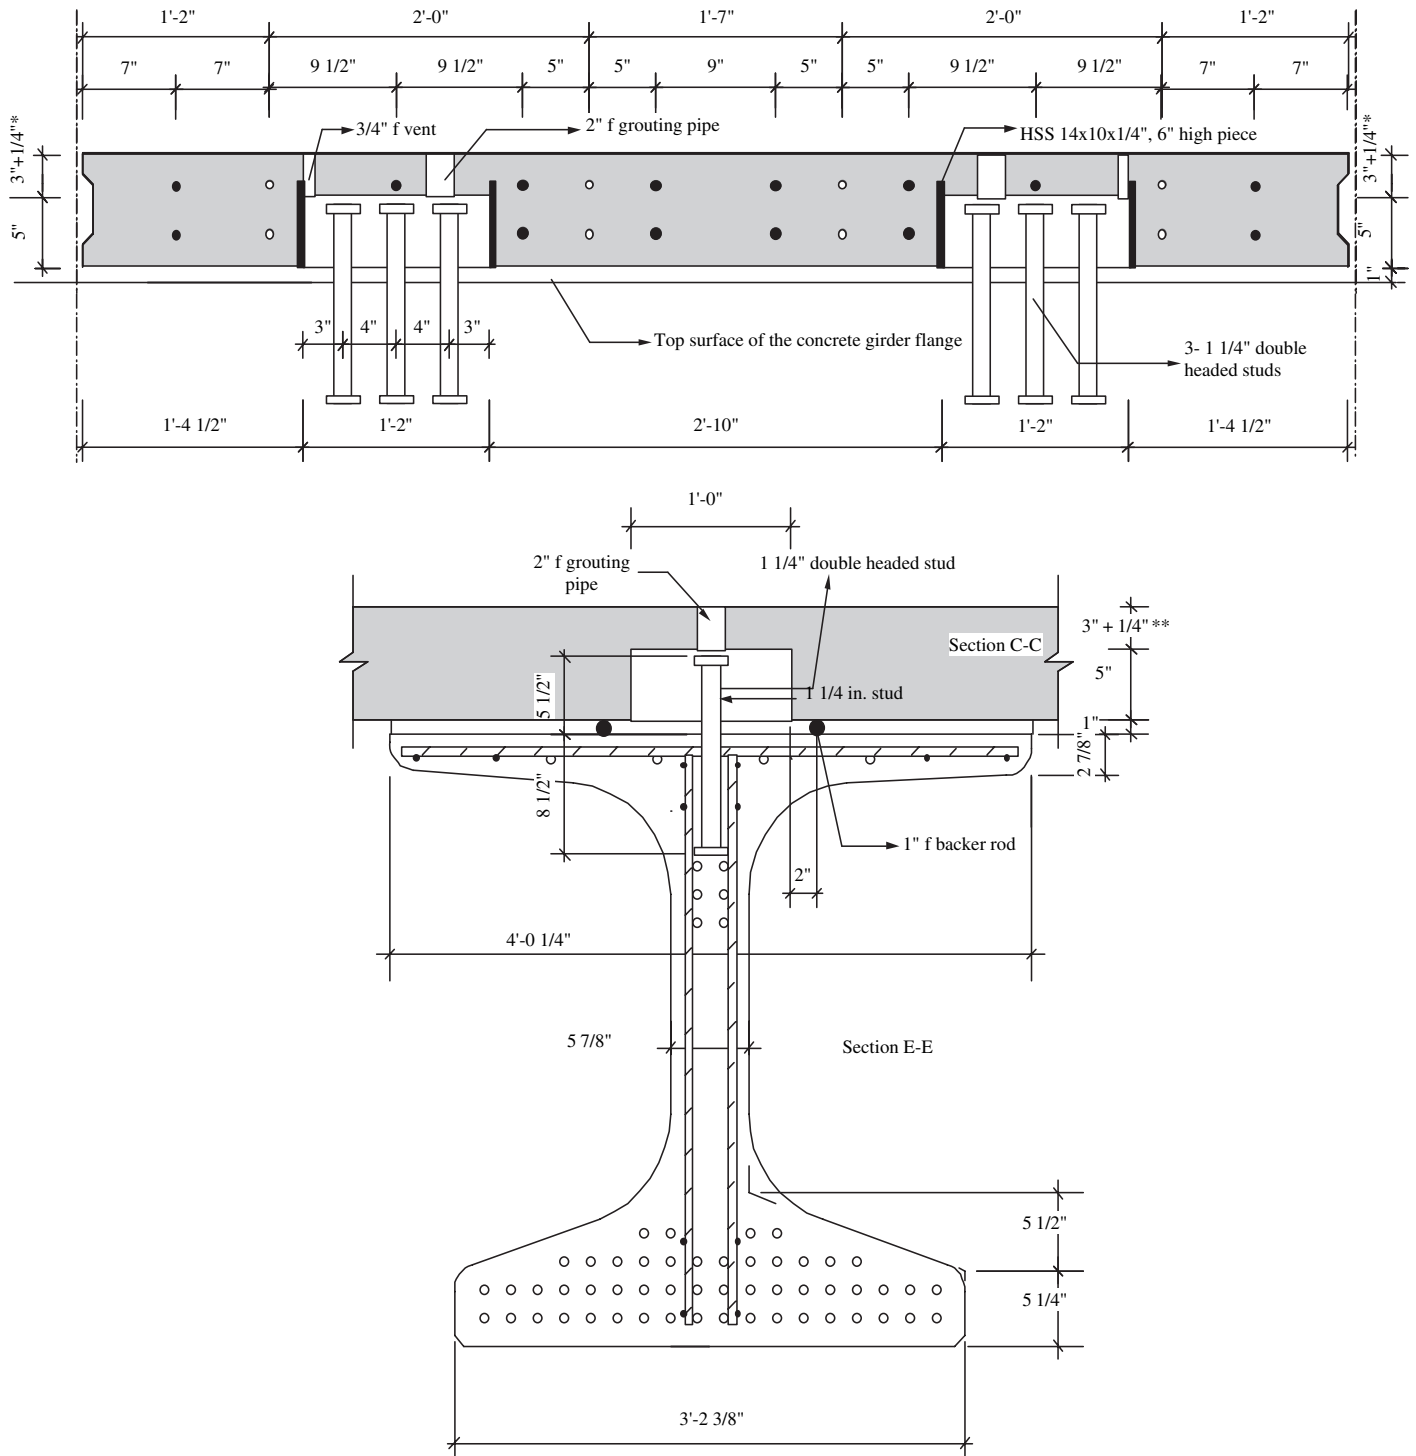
Sections C-C and E-E for concrete girders (*1/4-in. is used as a sacrificial layer for texturing).
